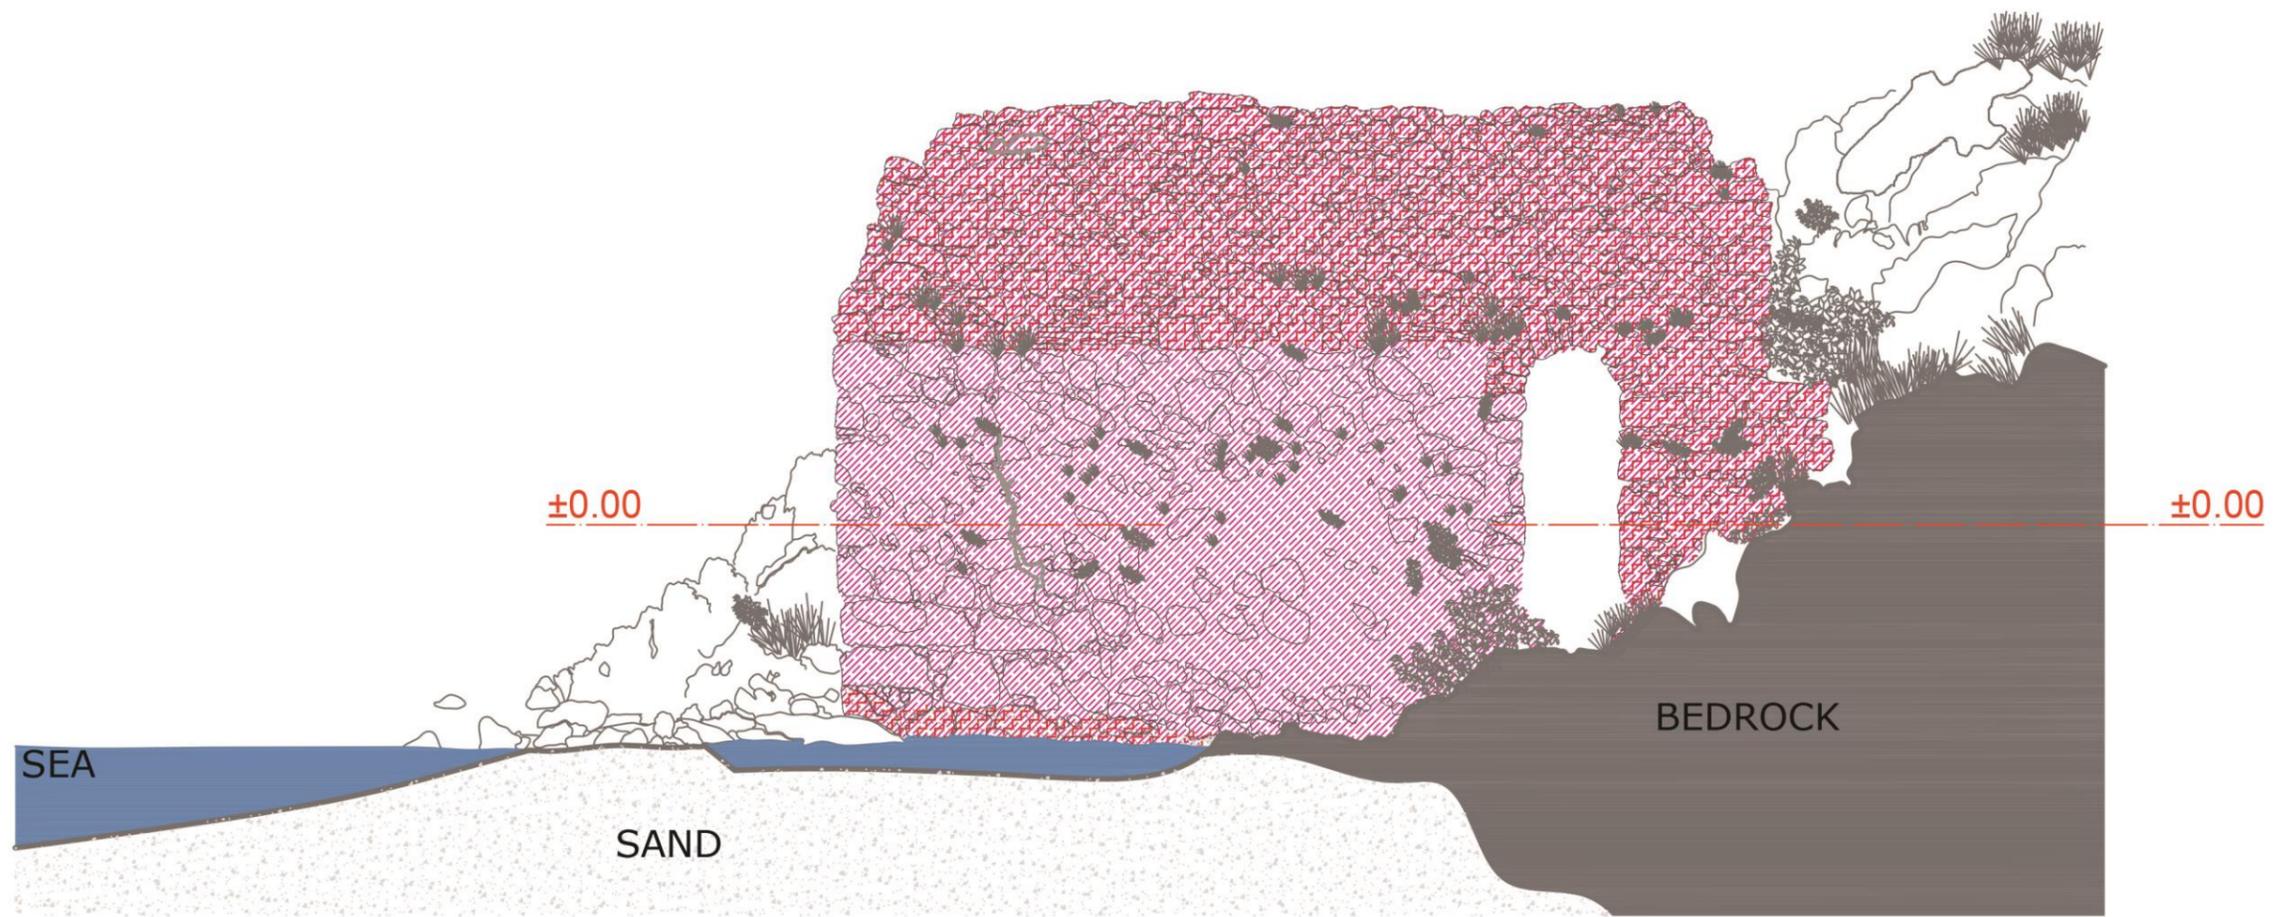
Plan -Structural Failures and Material Deterioration
